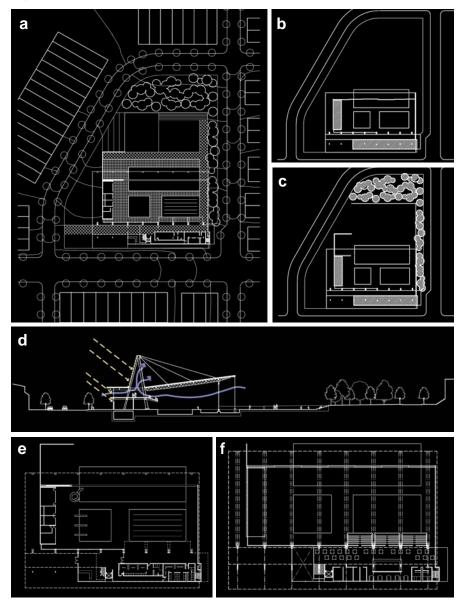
(a) Site plan; (b) spatial enclosure; (c) spatial extension; (d) site section; (e) ground floot plan; and (f) second floor plan.
